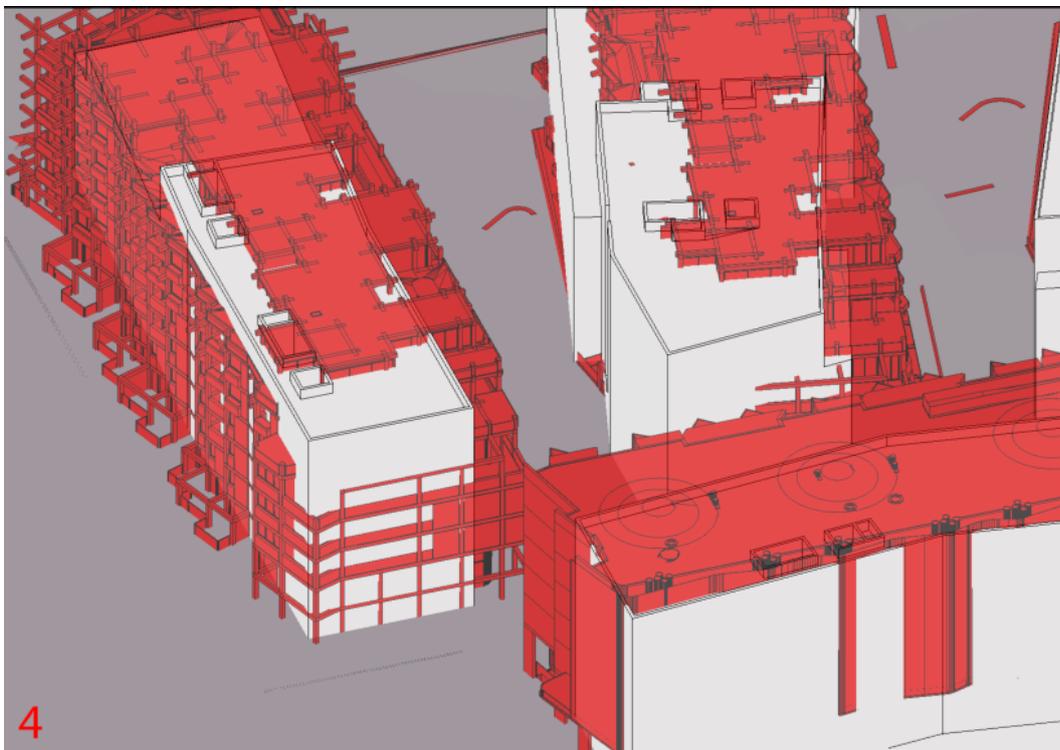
Relationship between buildings A, G and H showing how proposed (red) envelope is taller and closer across the plaza than the approved (white) envelope.
